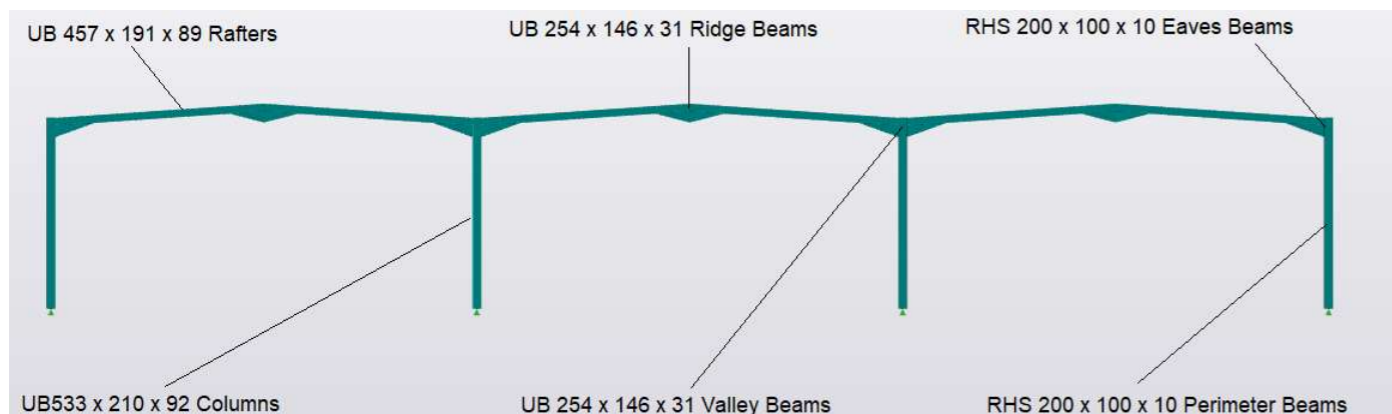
Typical Section Through Unit (Portal Frames at 6.793m Centres)
